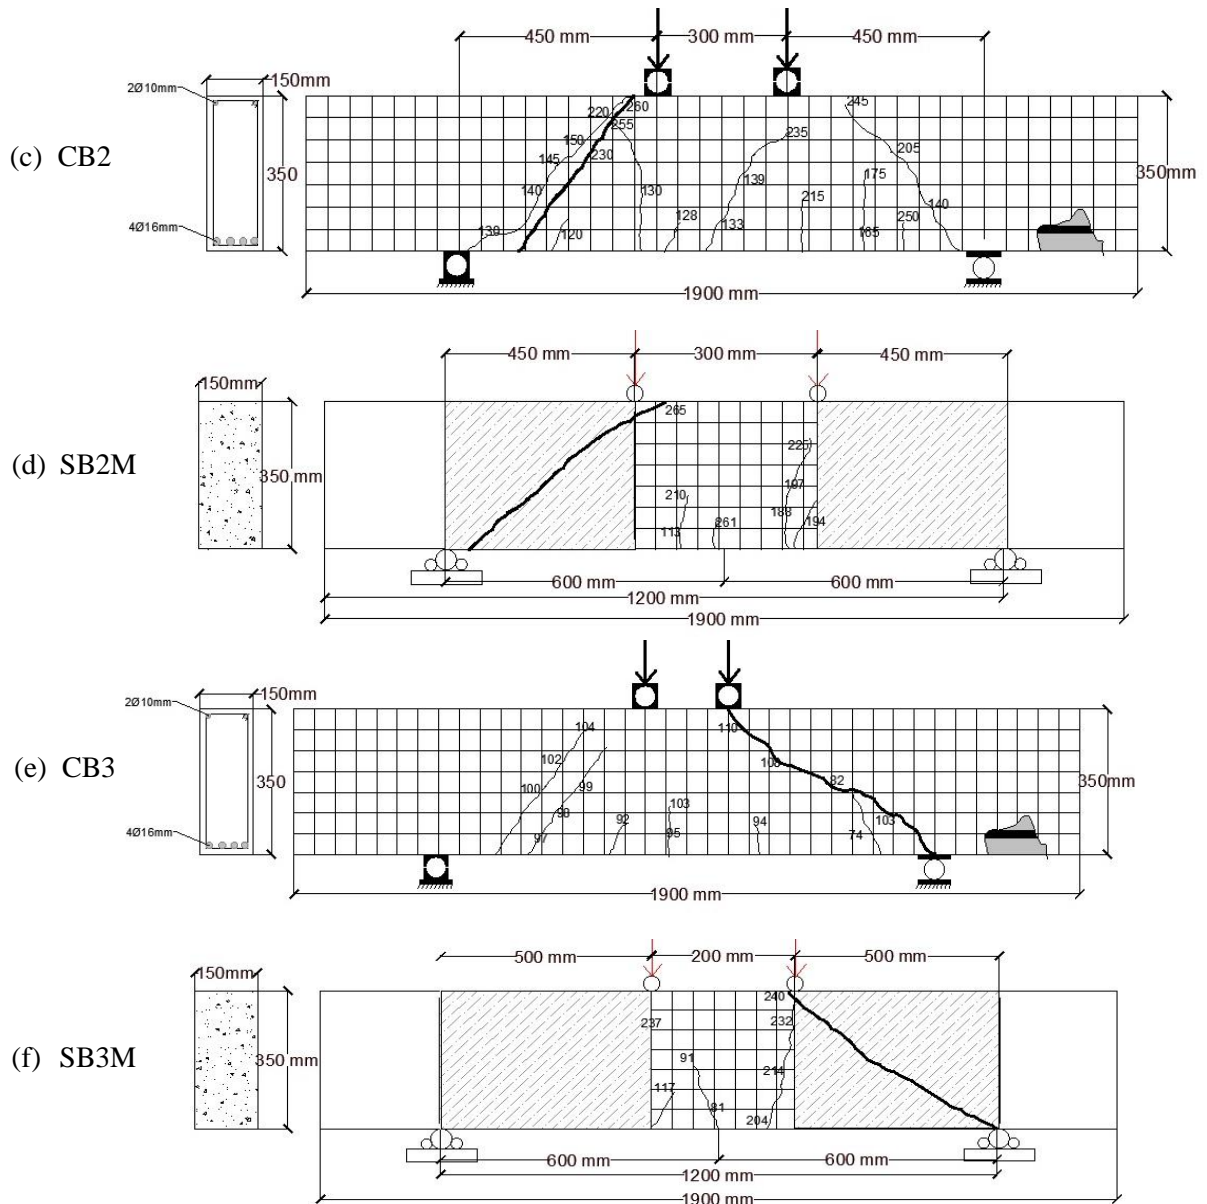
RC deep beam failure modes and cracking patterns
